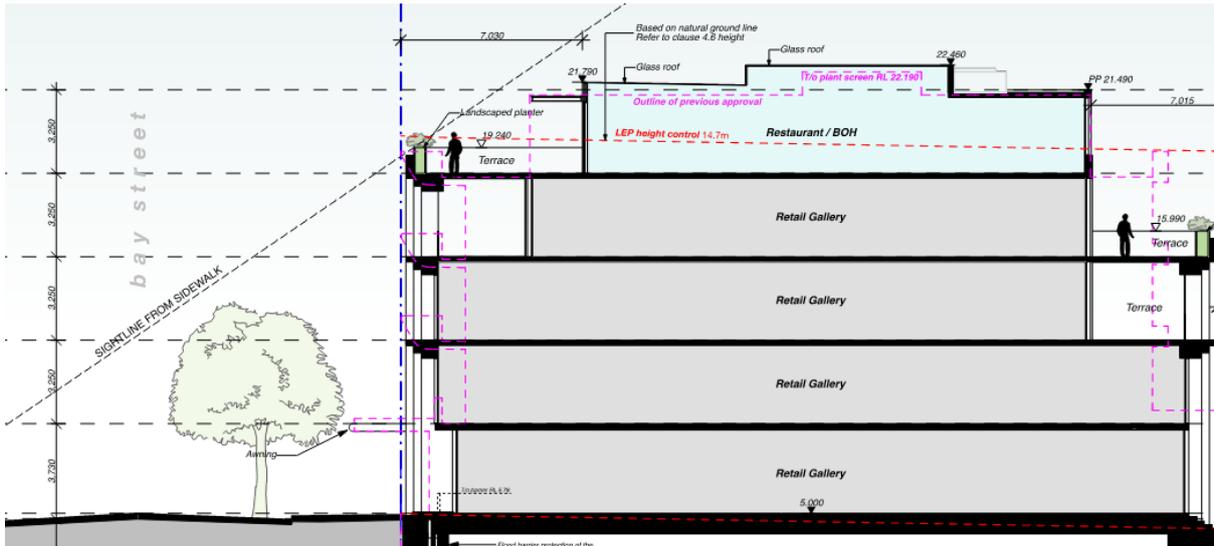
Approved elevations of 19-27 Bay Street, Double Bay (Restoration Hardware) DA 2023/245, with a ground floor retail height of 3.49m-4.09m and Level 1 – 4 retail heights of 3.25m
